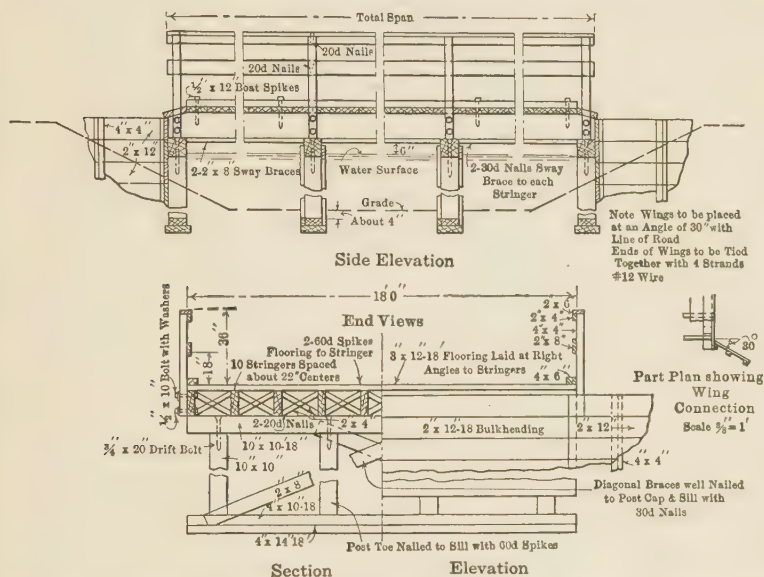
Multiple span wooden stringer highway bridge. Sacramento Valley Irrigation Co., Calif.
